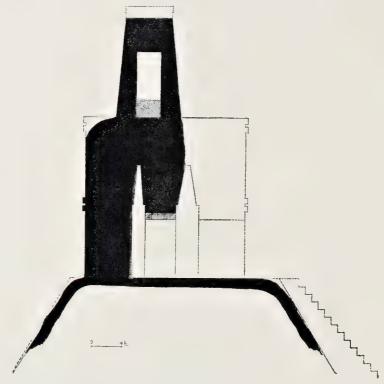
Temple A: cross-section showing room in tower and width of rooms.
